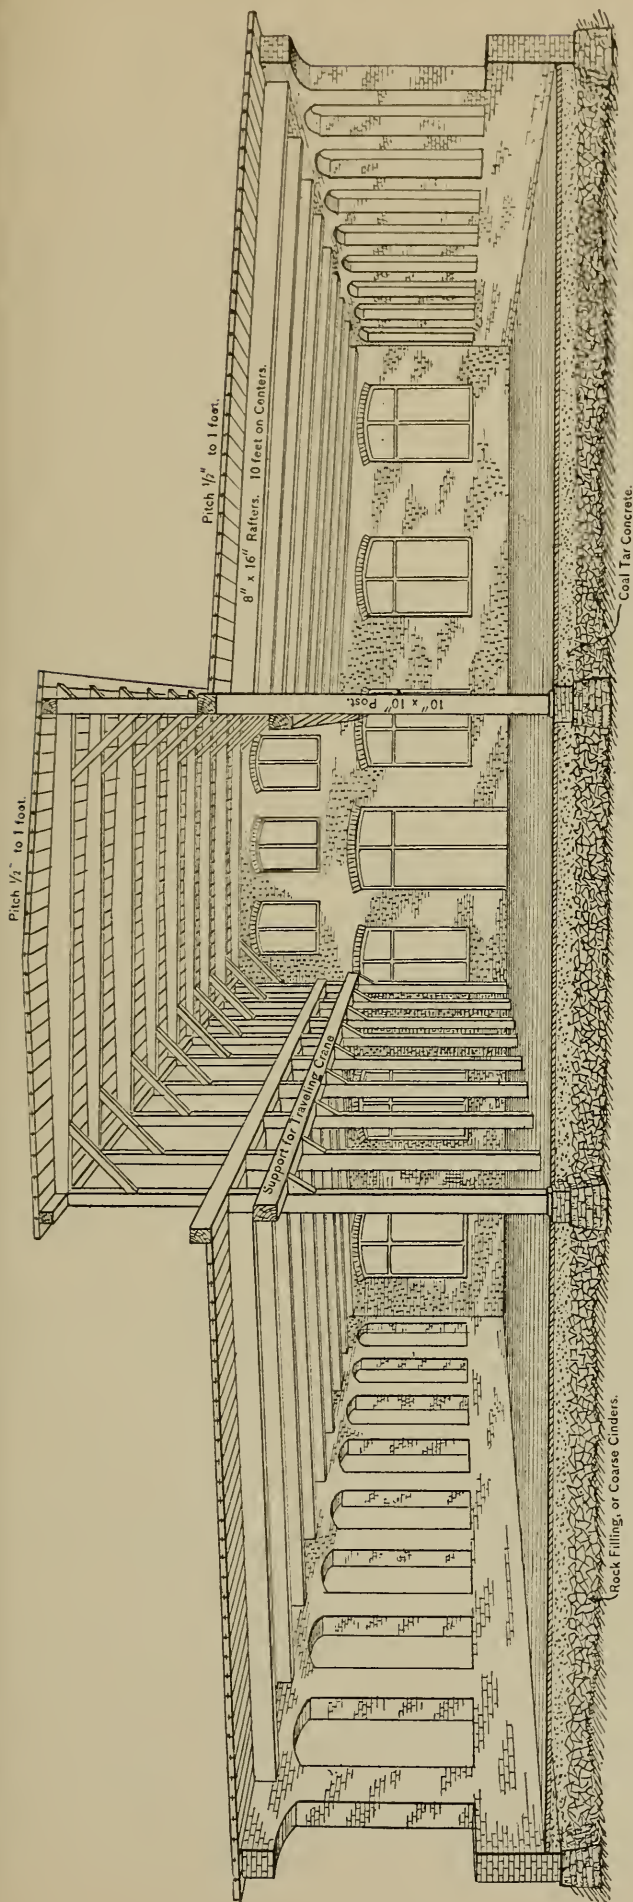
Machine Shop of one story, Slow-Burning Construction, of Brick and Wood.
